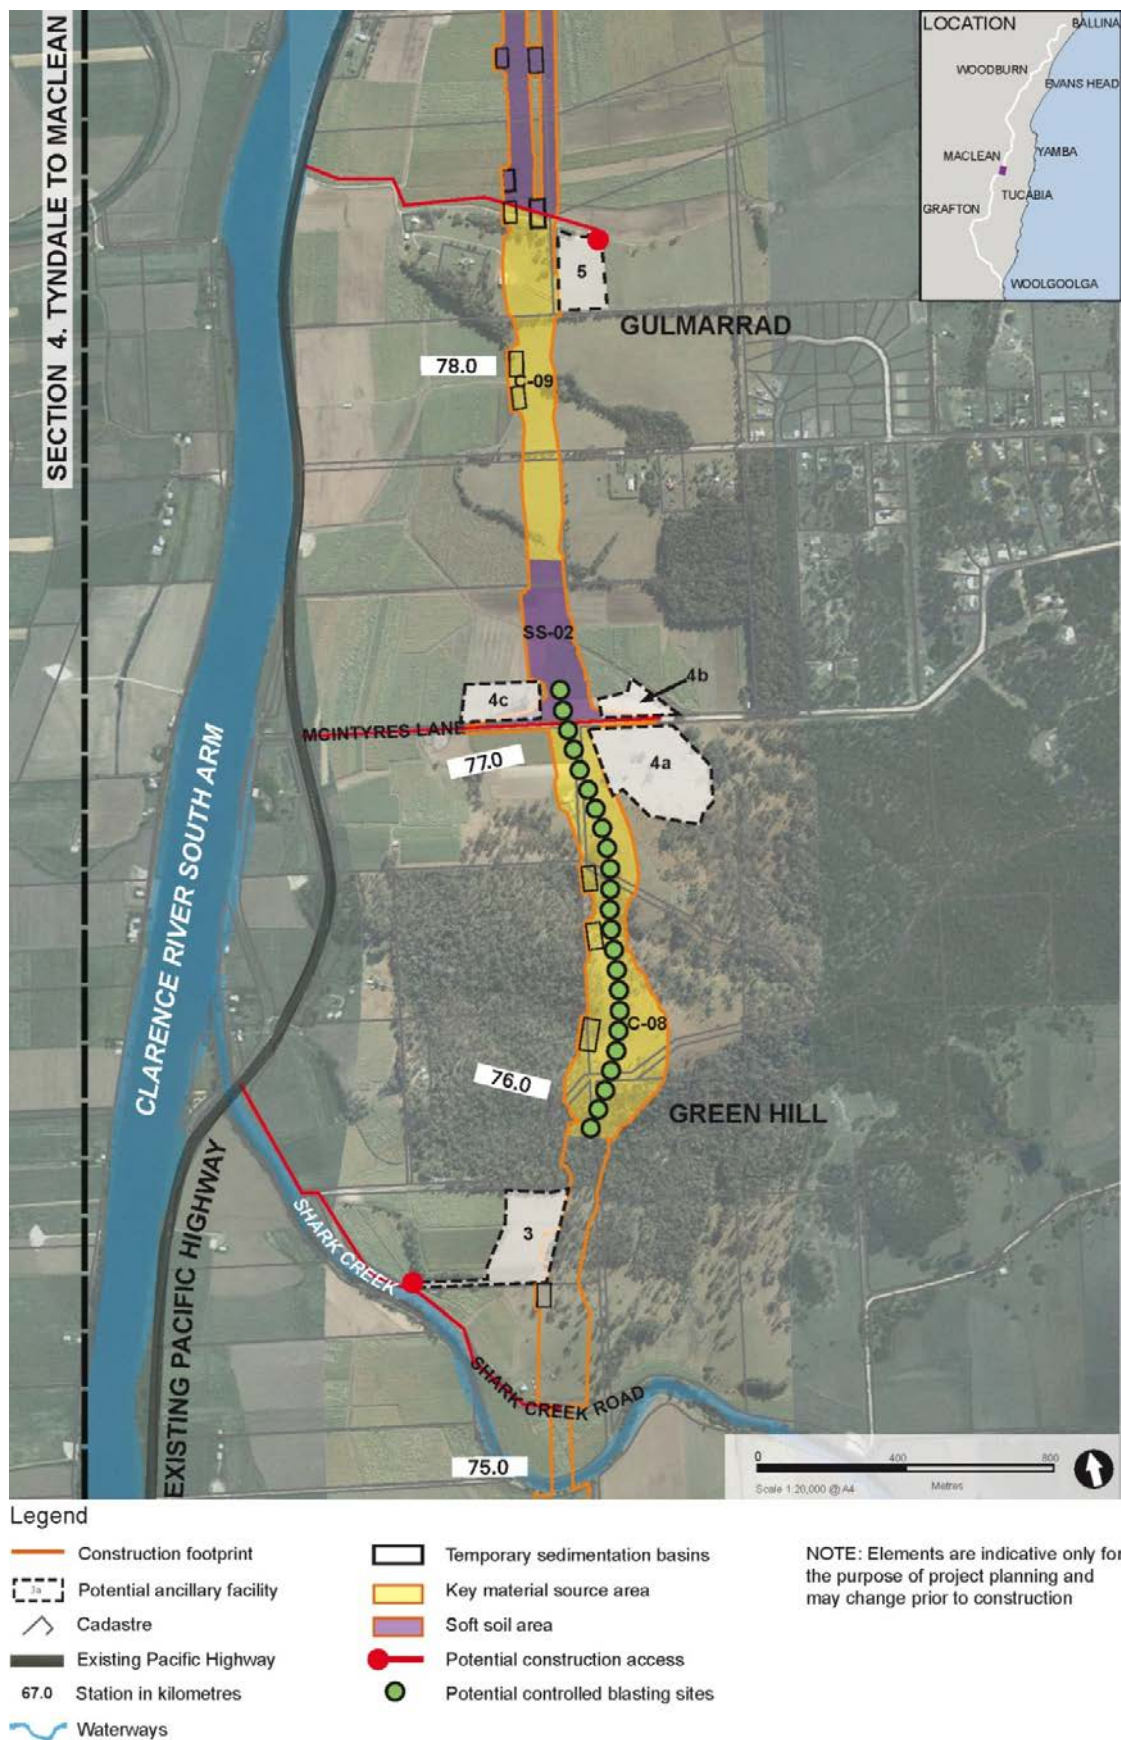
Extent of construction and construction features Section 4 (Station 75.1 to 78.9)
